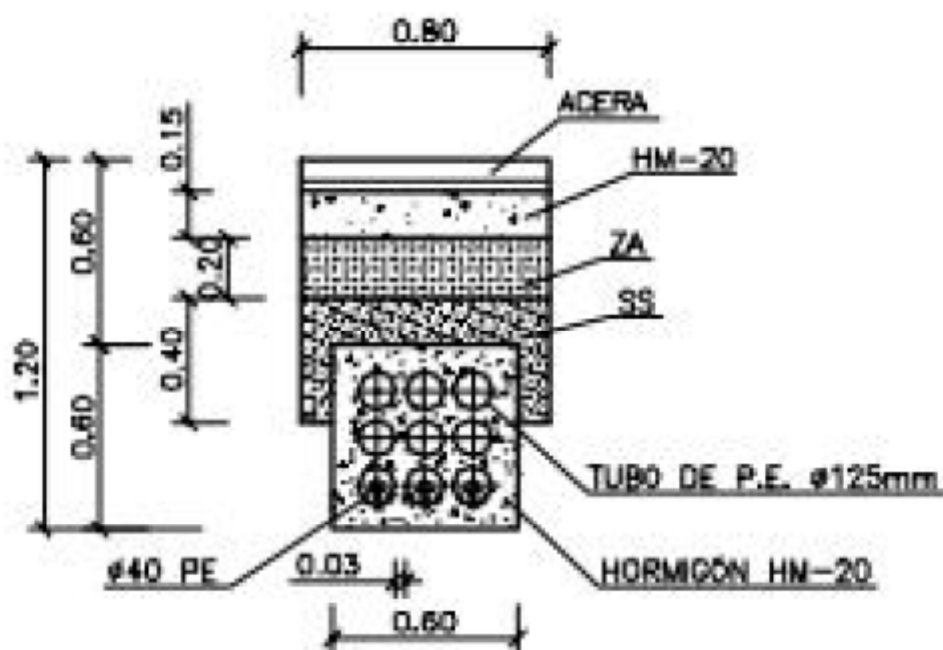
Canalization cross section of the telecommunications prism between L'Estany del Port Avenue and Street 114 (source: Esteyco)
